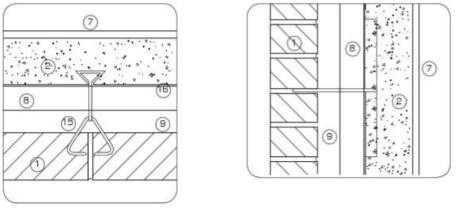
DETAIL A&B: BRICK ATTACHEMENT / WINDOW DETAIL
